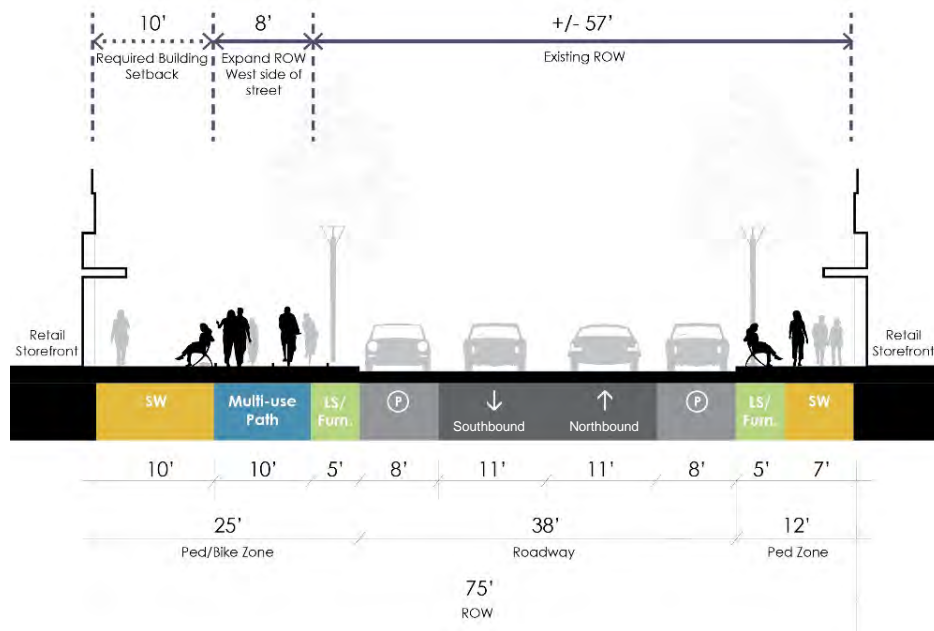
Retail Street Illustration (Main Street View Looking Northwest Between 17th Pl. NE and 18th St. NE)
